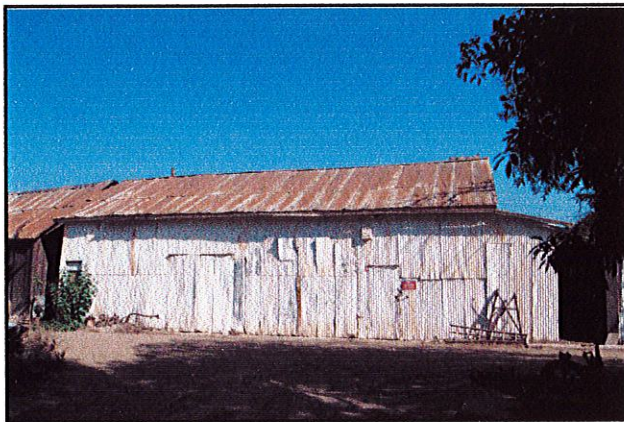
Metal barn, ca. 1918 and 1930–1940. This view is facing east, toward the west elevation. Note the shed addition to the south (right of frame.) Photograph date, November 5, 2002.
